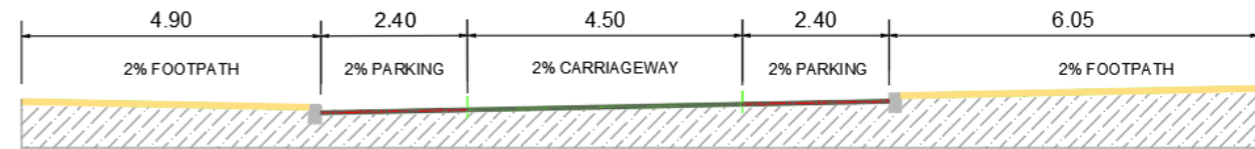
Typical Cross Section of O’Connell St East (from Mary St. junction to Main Guard)
